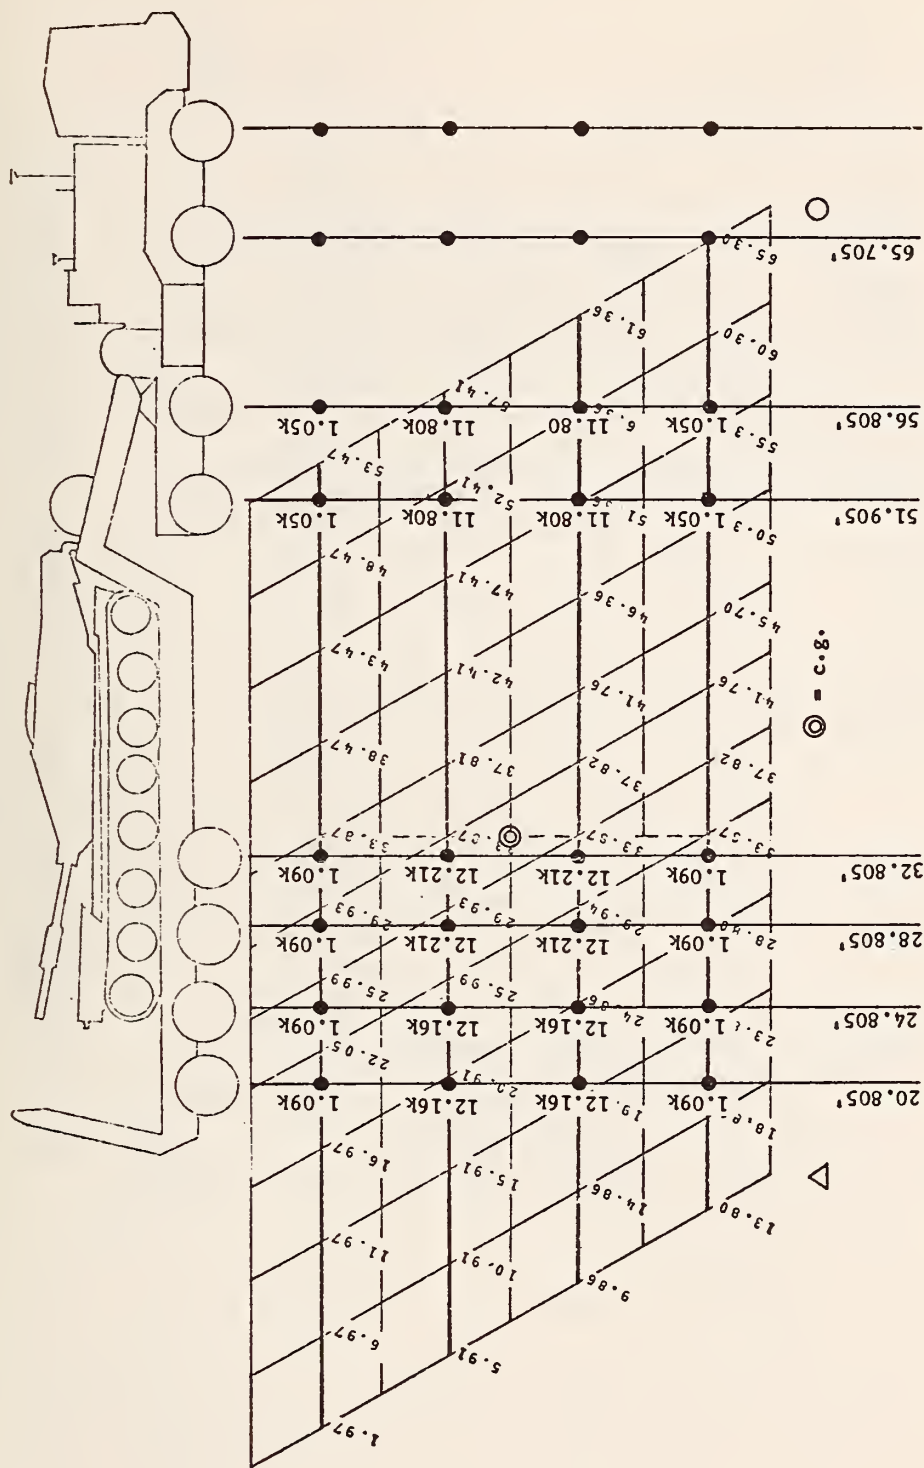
LOAD CONDITION 1, BRIDGE 3. CENTER OF GRAVITY OF HET-70 WHEEL LOADS ON BRIDGE IN LOCATION USED TO CALCULATE THE BRIDGE MOMENT OF TABLE 1.
